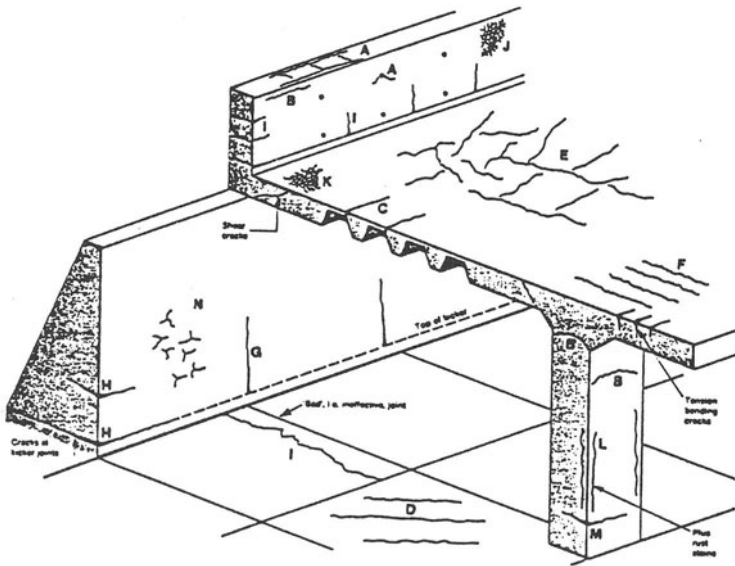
Examples of cracks in hypothetical concrete structure.
